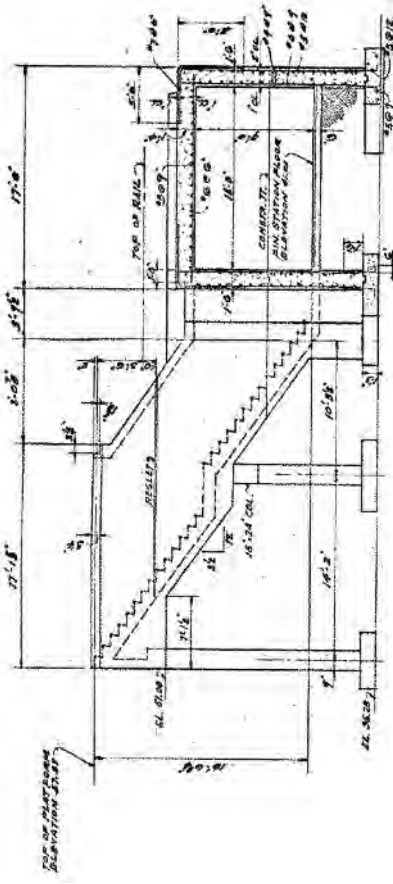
Excerpt from historical drawings of the Mason Stationhouse section, 1961. Courtesy of the CTA.
